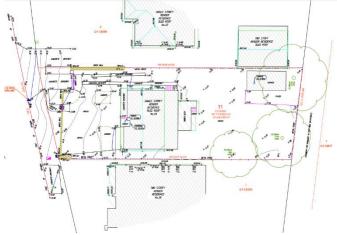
Detail Survey of Site at Lot 11 of DP 263267
